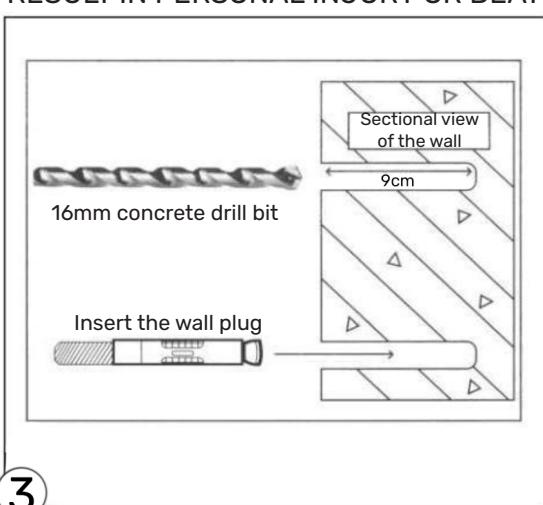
The holes should be 9 cm deep in the wall and should be drilled in a solid brick or concrete wall. Do not drill into mortar as this will not provide the required support for the blind.
